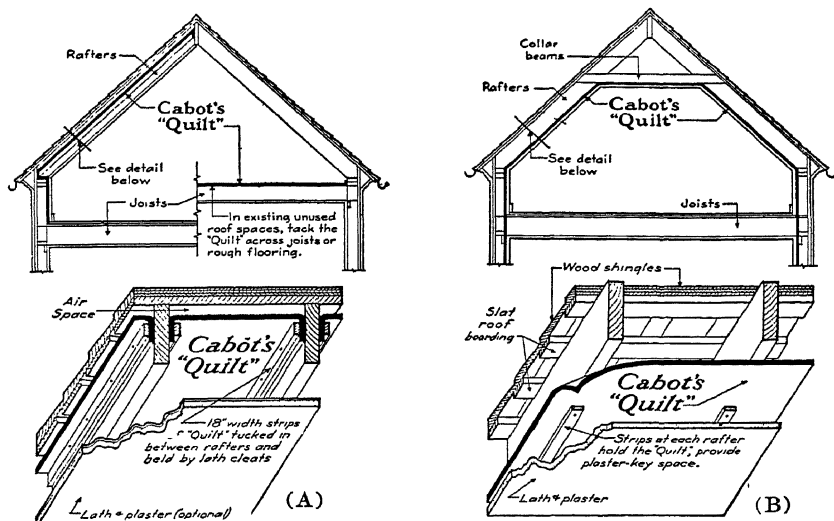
Roof Sections Showing Application of Quilt Type of Insulation
